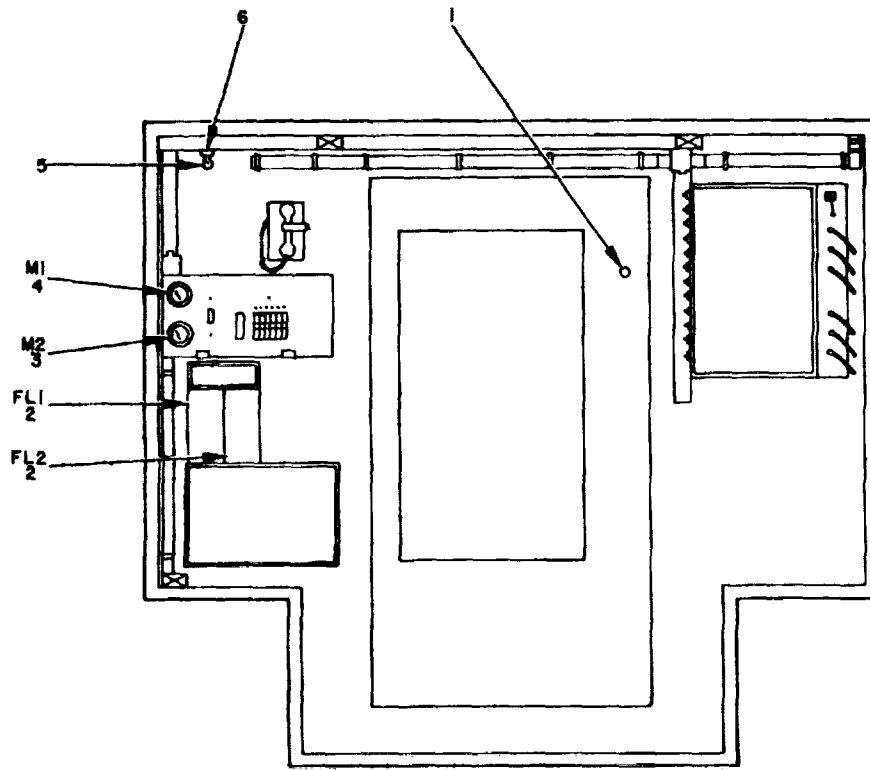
Shelter, Electrical Equipment S-412/TCC-72, Roadside Wall.
